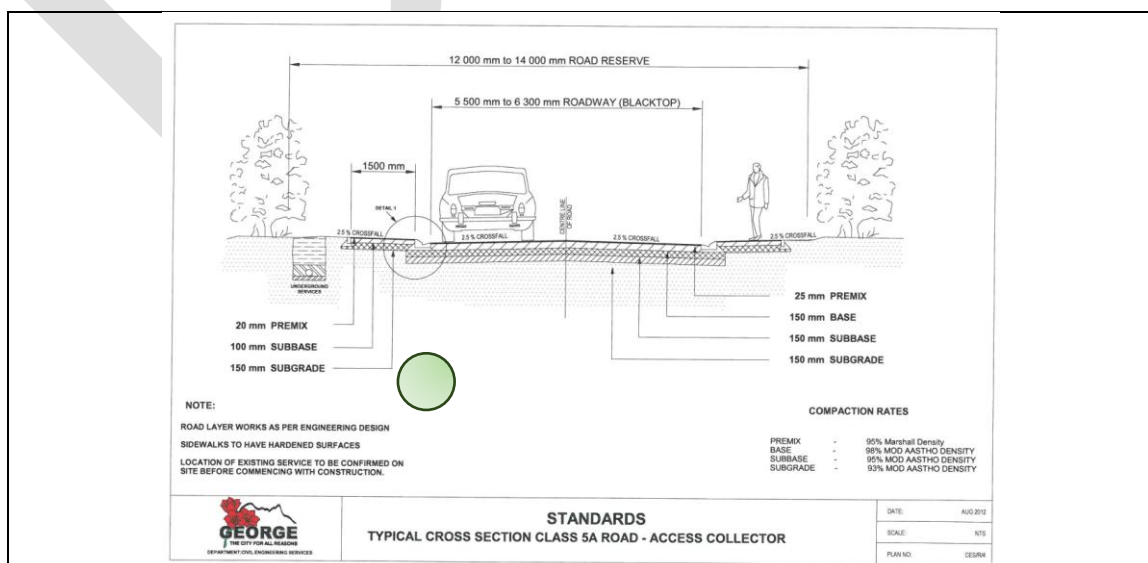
Position of existing Storm Water pipes (green) in Road Cross Sections
